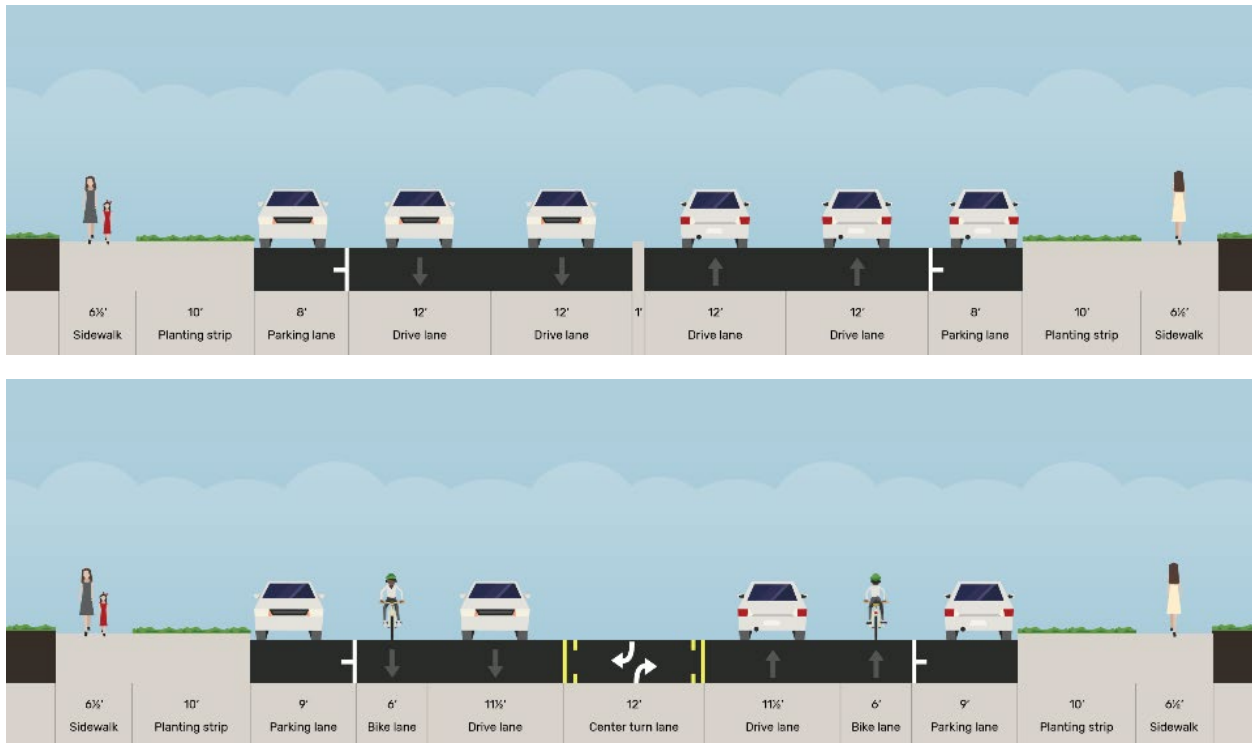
Cross section diagram of Highway 65 / South Broadway in Albert Lea, MN before (top) and after (bottom) road redesign.
